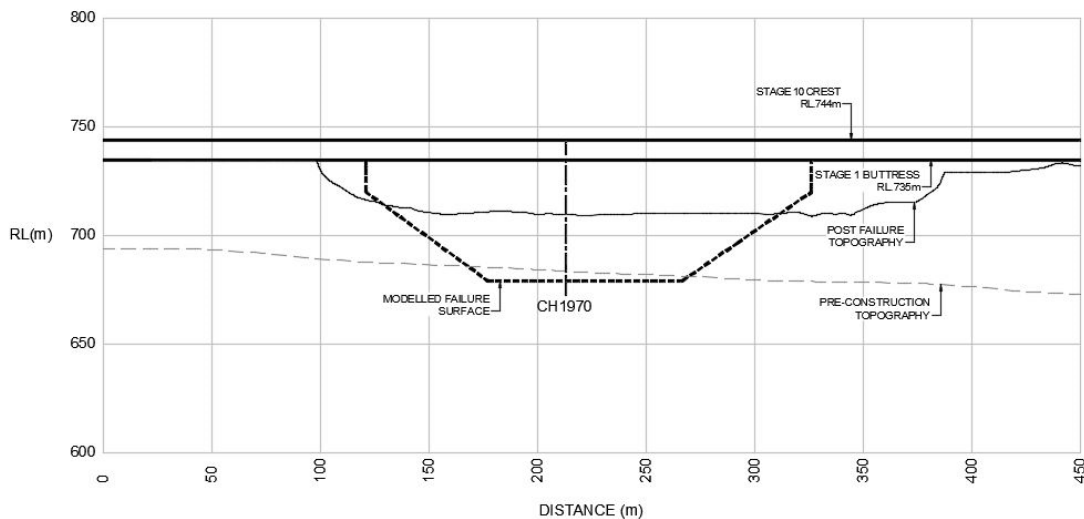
Cross-section of slump through Stage 1 Buttress showing modelled failure surface
